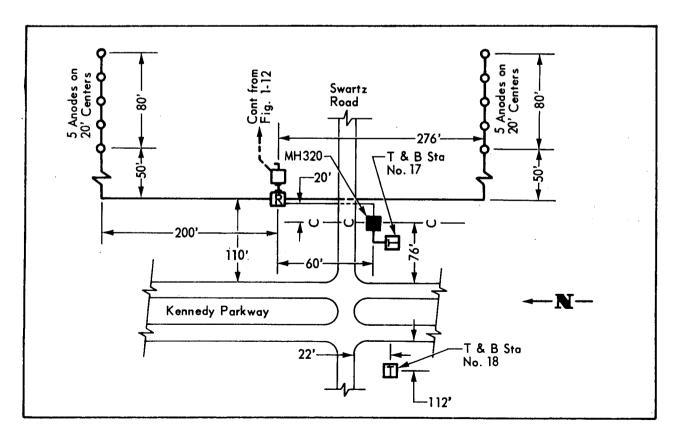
Site No. 12 and Test and Bond Stations No. 17 and 18 Equipment Locator
